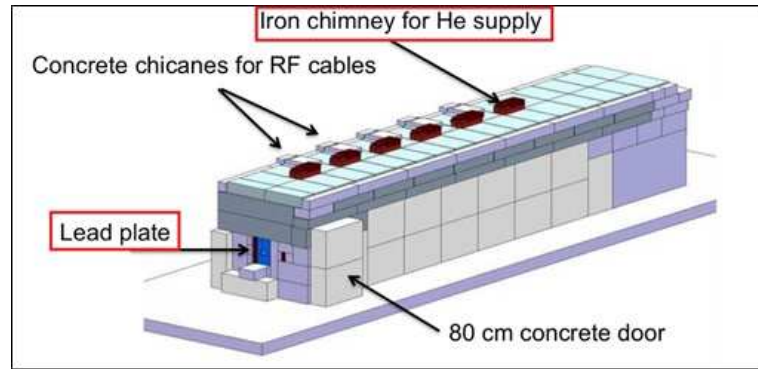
Shielding design for the HIE-ISOLDE post-accelerator.
